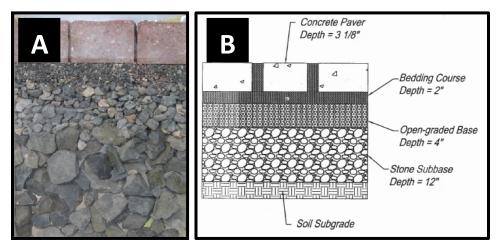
Cross section view of Eco-Loc Permeable Concrete Pavers and underlying base materials in Photo A and Graphic B (original images from MacKay & Sposito, Inc.)
